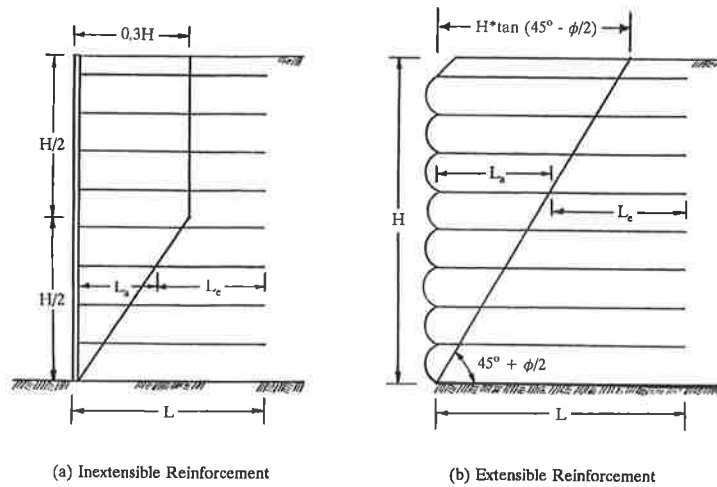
Locations of potential failure surface in reinforced soil walls.
